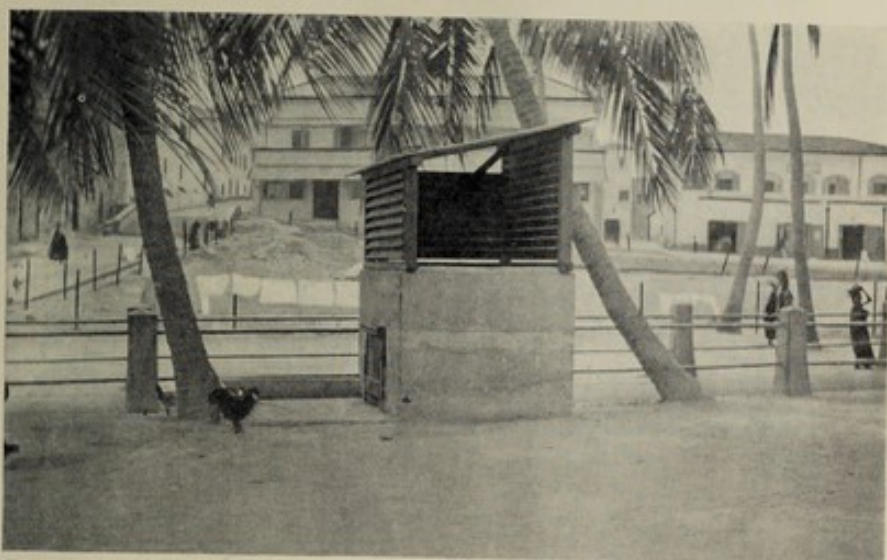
Concrete Dustbin, with concrete raking platform. Too high for goats and fowls to get in. (For plan see Appendix Q.)
